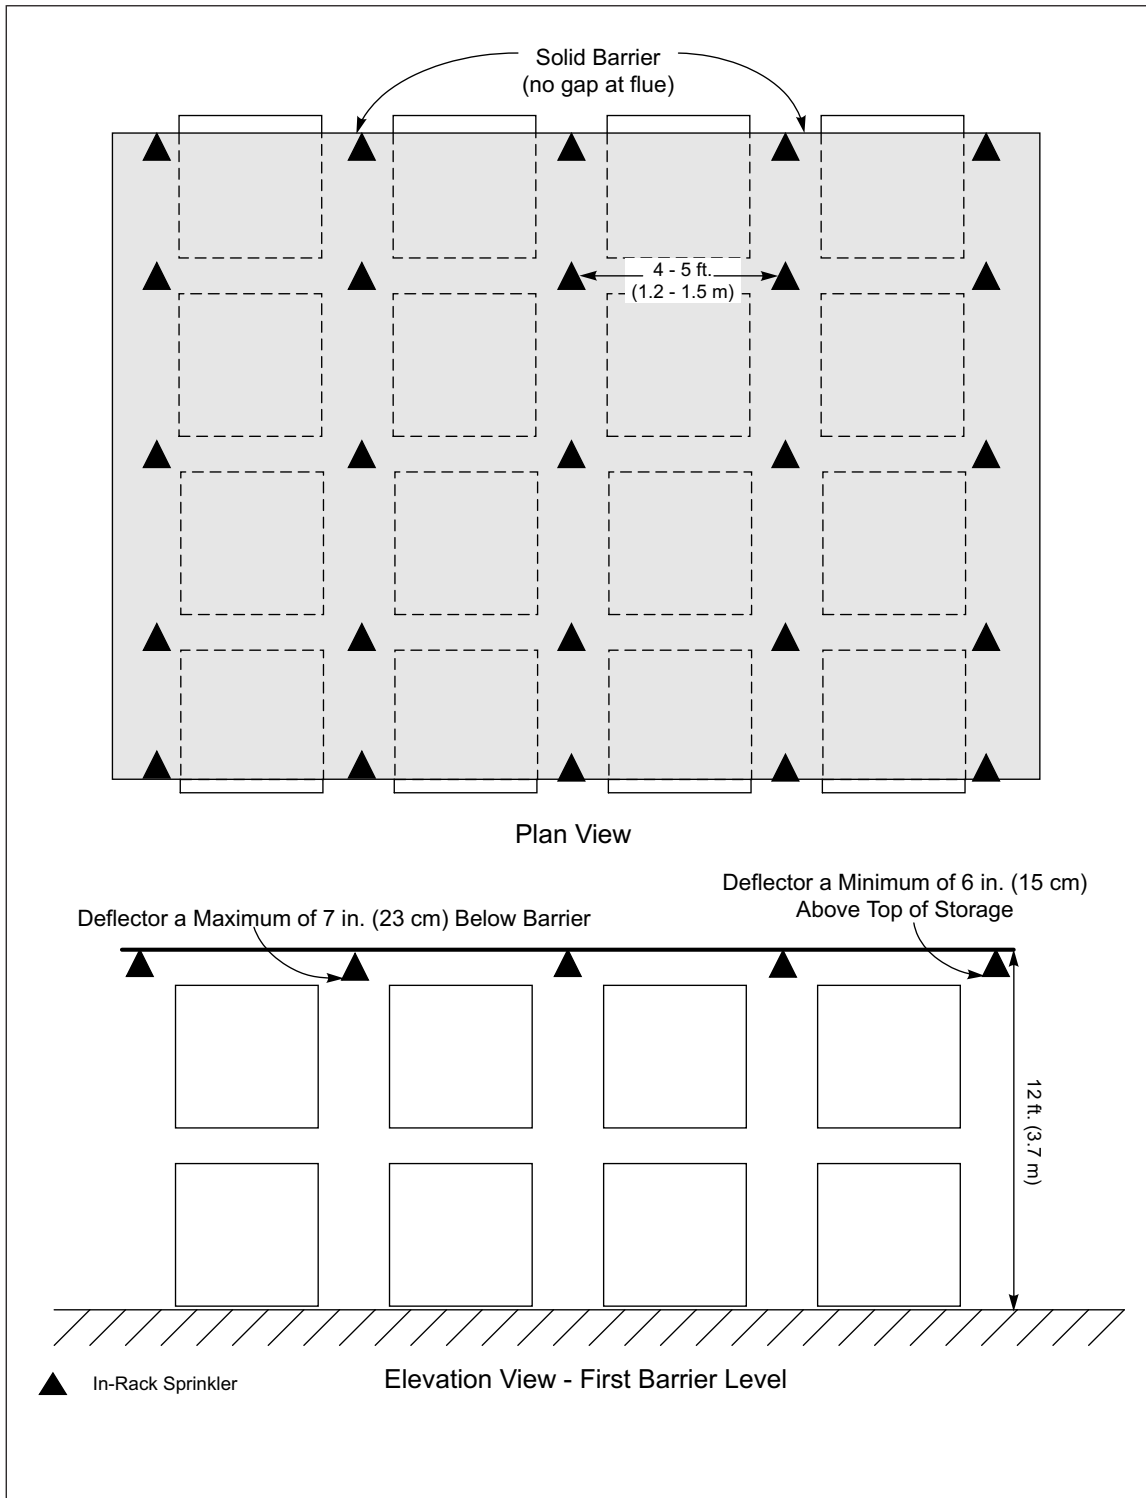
Multiple row rack in-rack sprinkler layout — Fire Protection Scheme A
